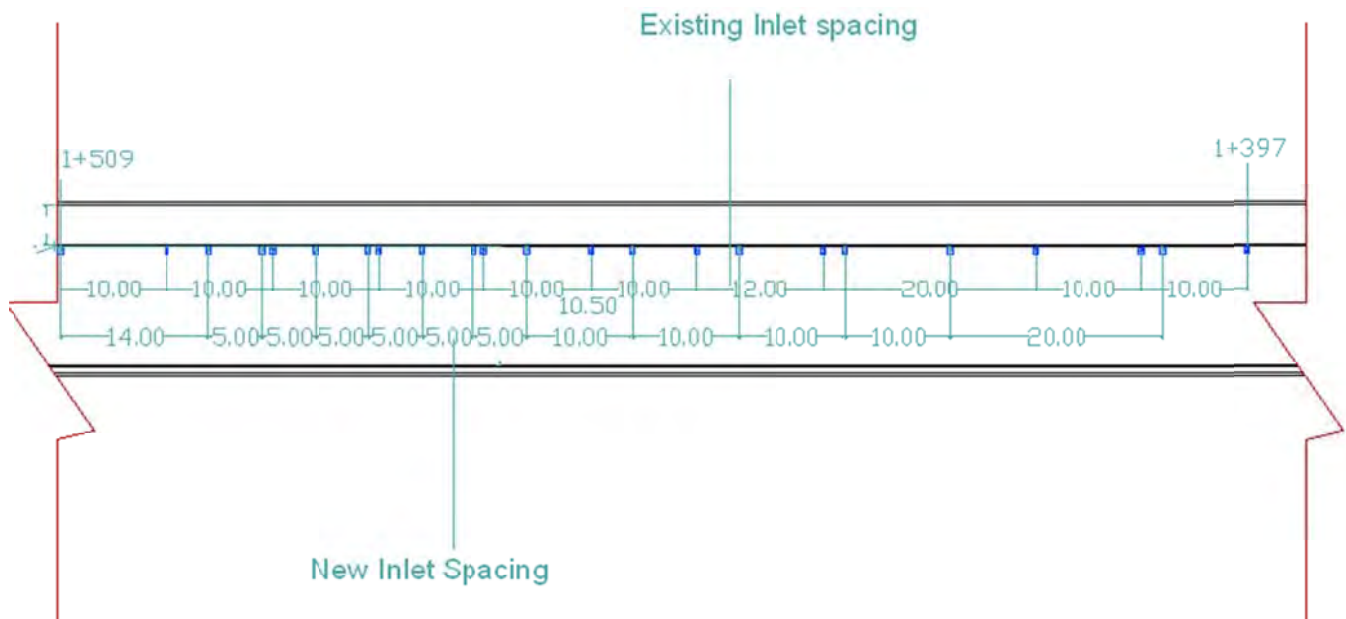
Existing and new computed inlet spacing at Gotera – Wollo sefer road.
